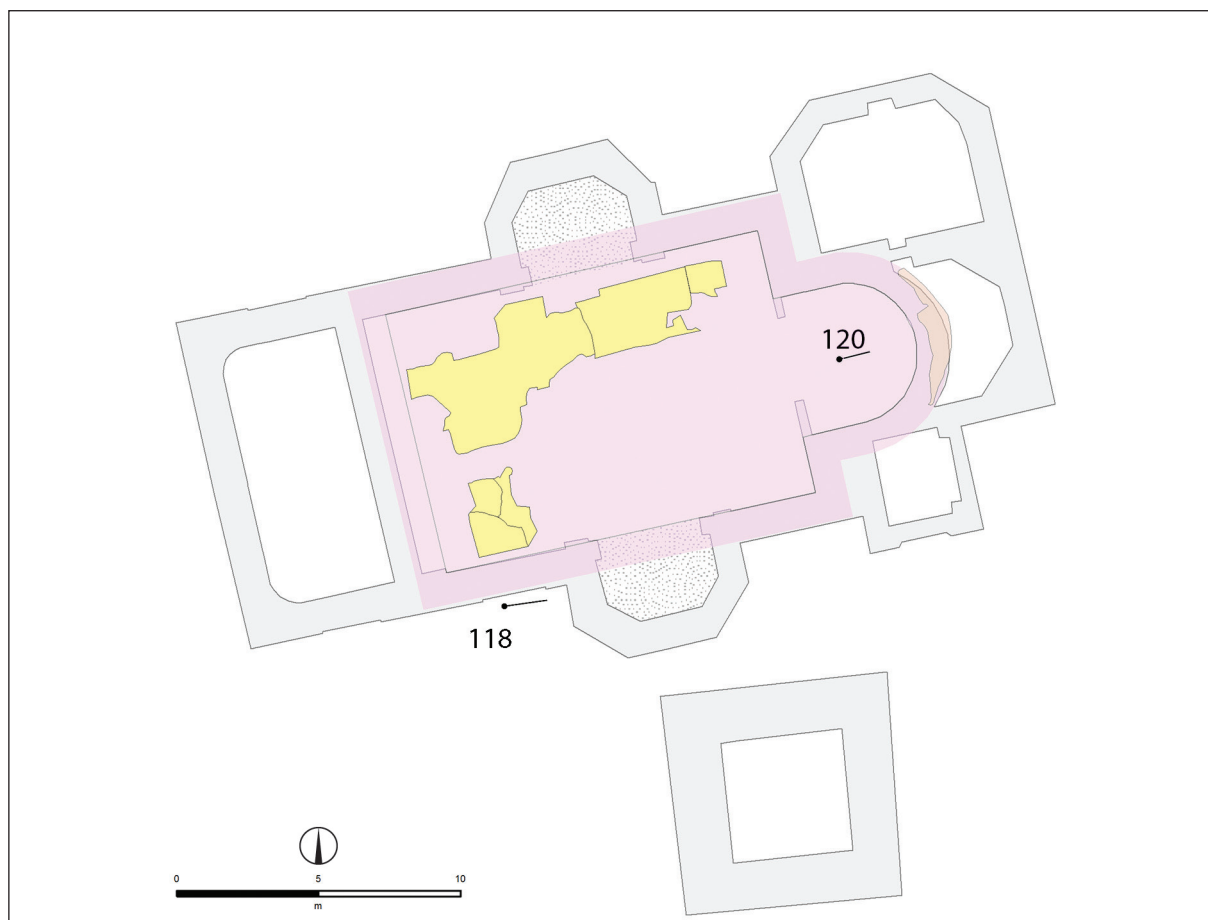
Bled Island, Phase 3, building with horseshoe-shaped apse, ground plan reconstruction: reconstructed ground plan in purple, mortar pavement in yellow, wall foundations in brown, present church walls in grey; location of grave No. 118 is marked.
